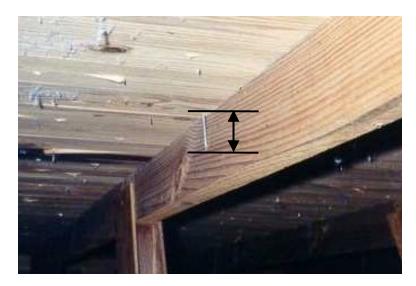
Roof Deck Attachment Rating Requires an Attic Inspection.
